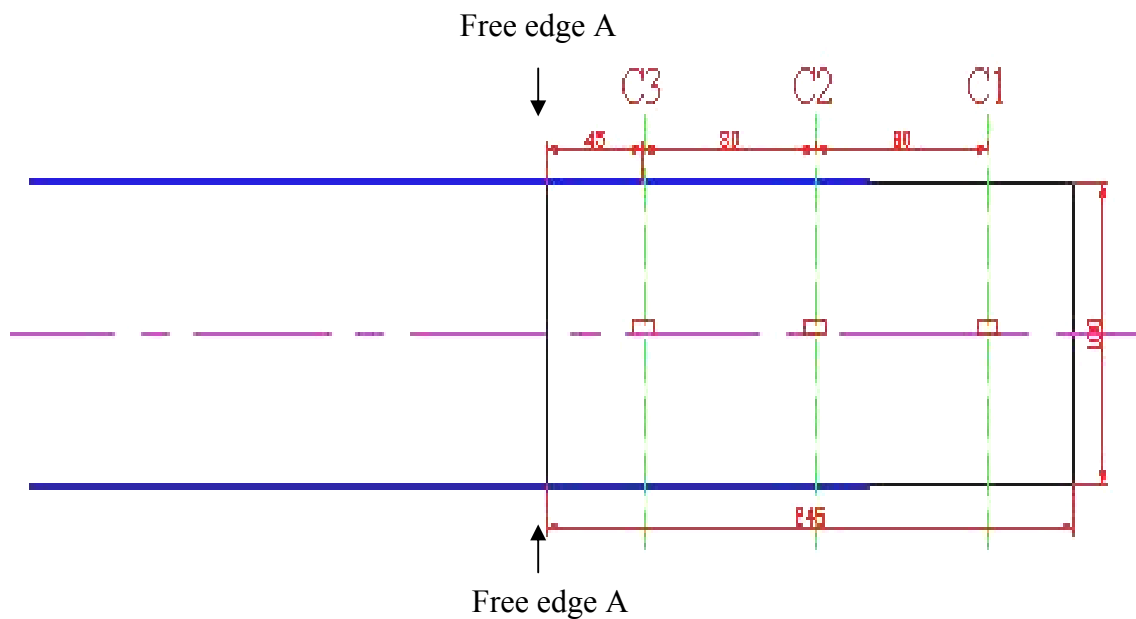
(c): Schematic diagram of Gauge locations on concrete prism for Control II and Hot/Dry/Wet samples
